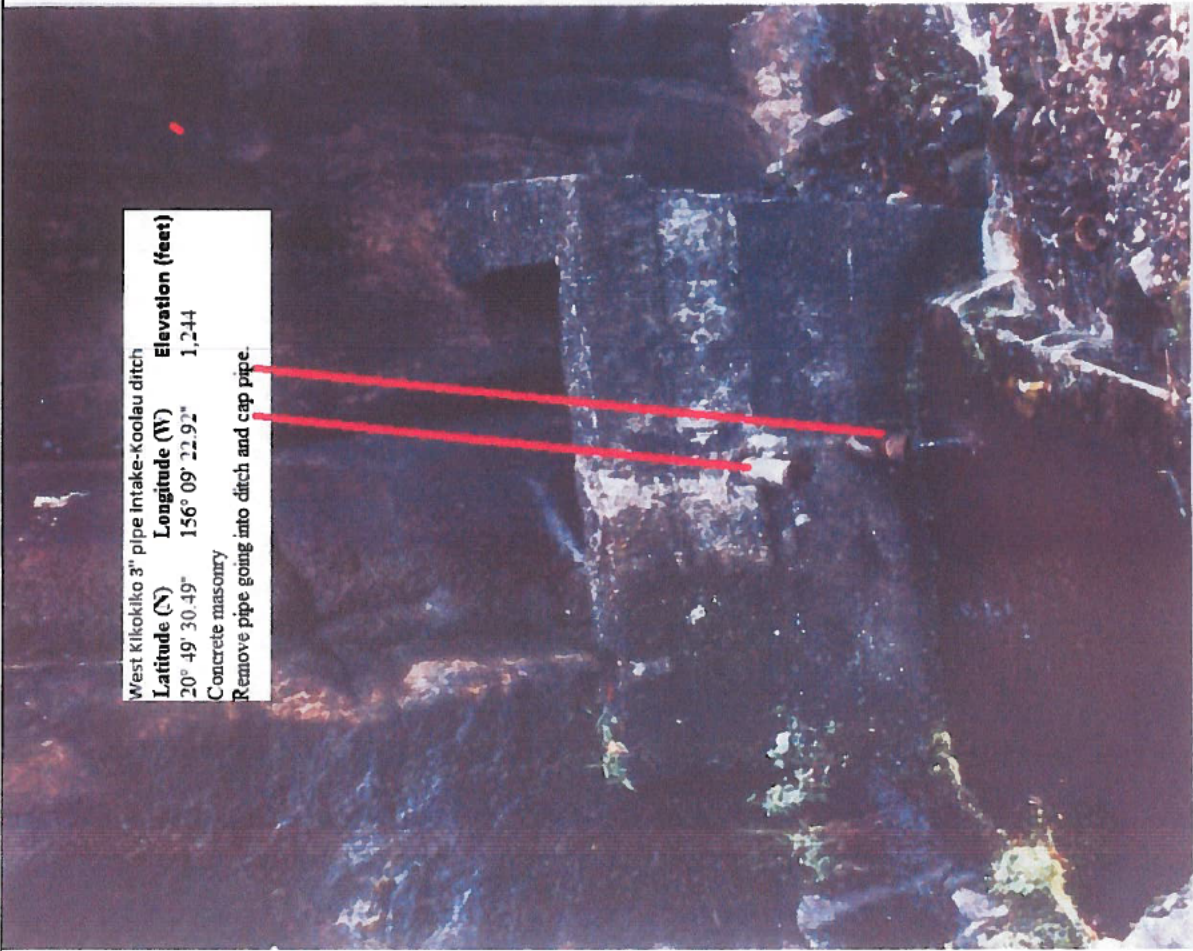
West Kikokiko small intake at Koolau Ditch #1 of 4 (K-25c) (Kikokiko 6-inch pipe intake mauka of bridge) Pipe shown was removed in 2007.
